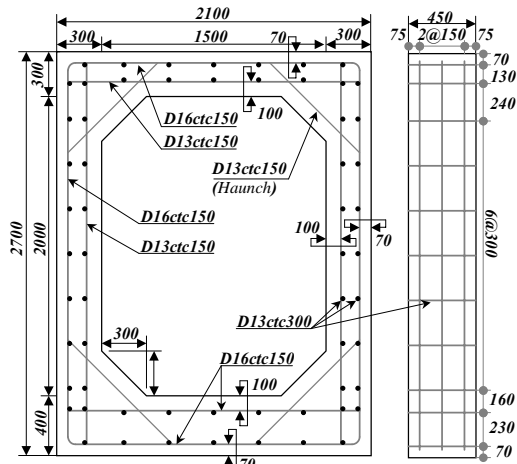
Section dimensions and reinforcement arrangement of the corroded specimen (Unit; mm)
